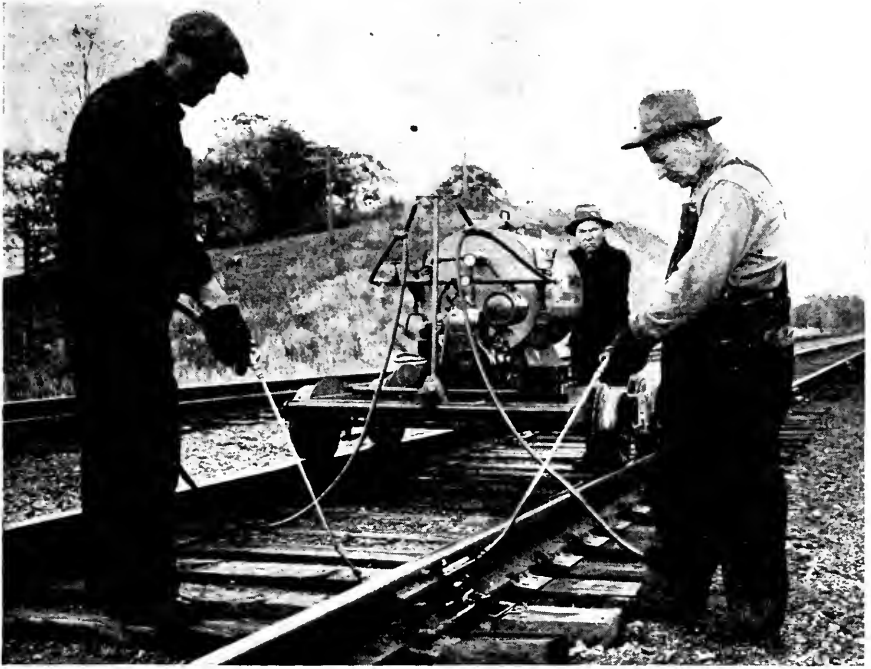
Oiler Equipped With Two Hand Sprays.
